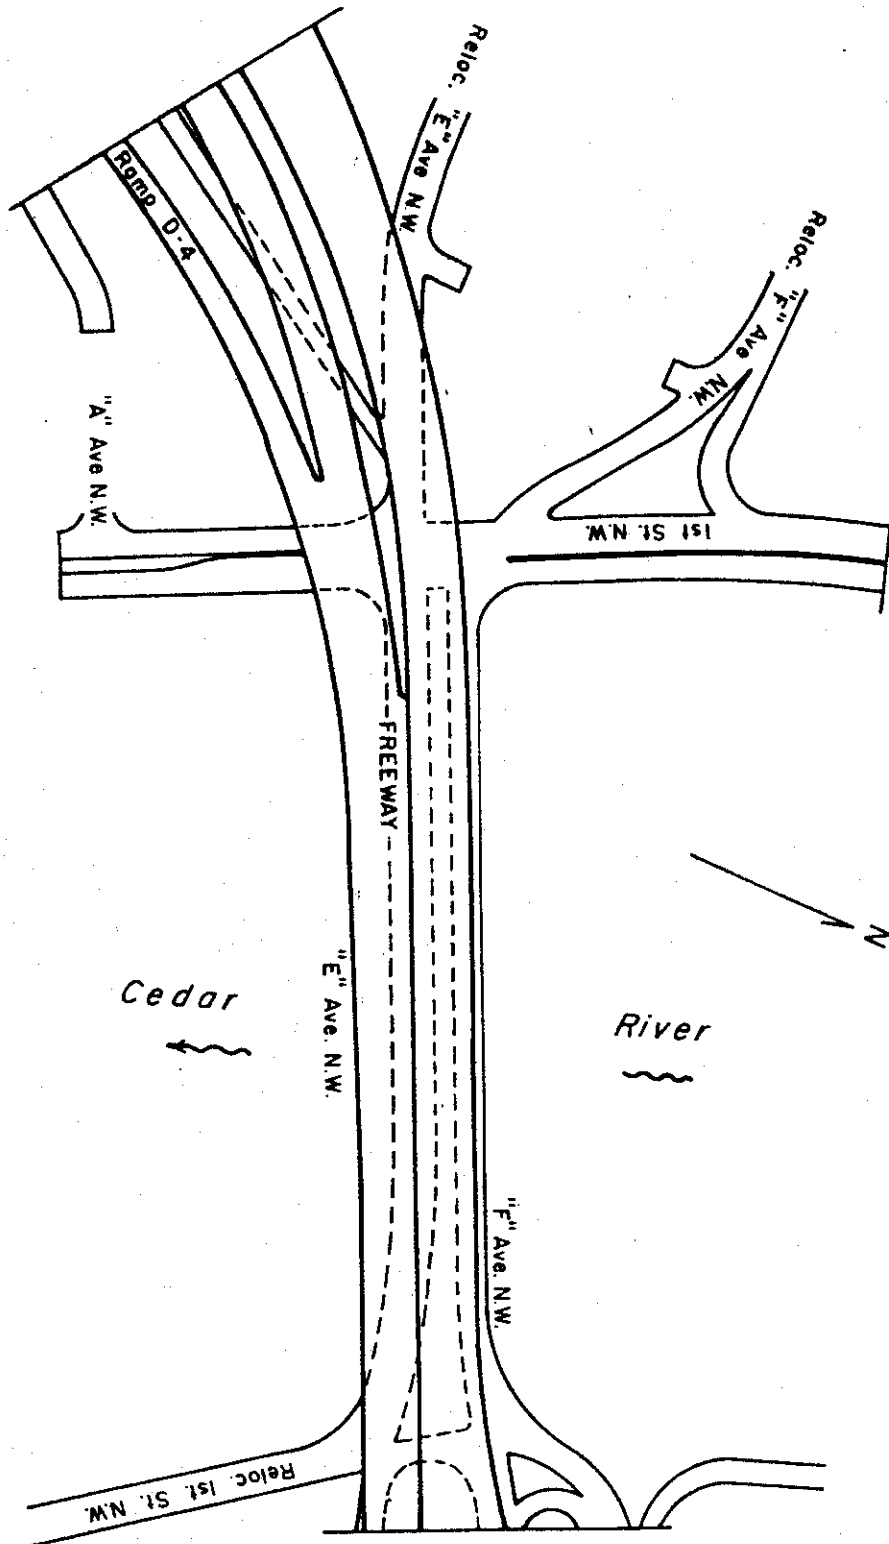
Road configuration in the 5-in-1 bridge and dam.
